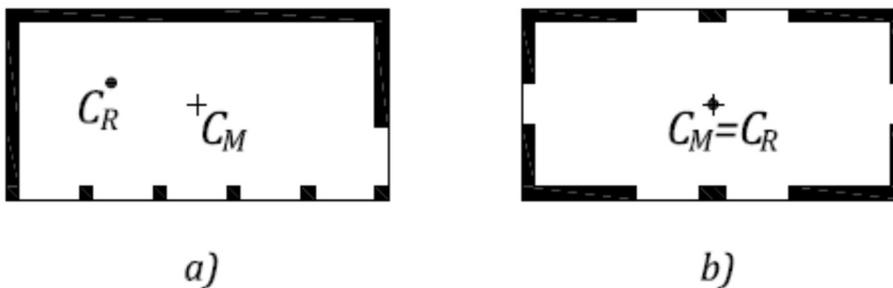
Building plan: a) non-symmetric wall layout (significant torsional effects), and b) symmetric wall layout (minor torsional effects).
